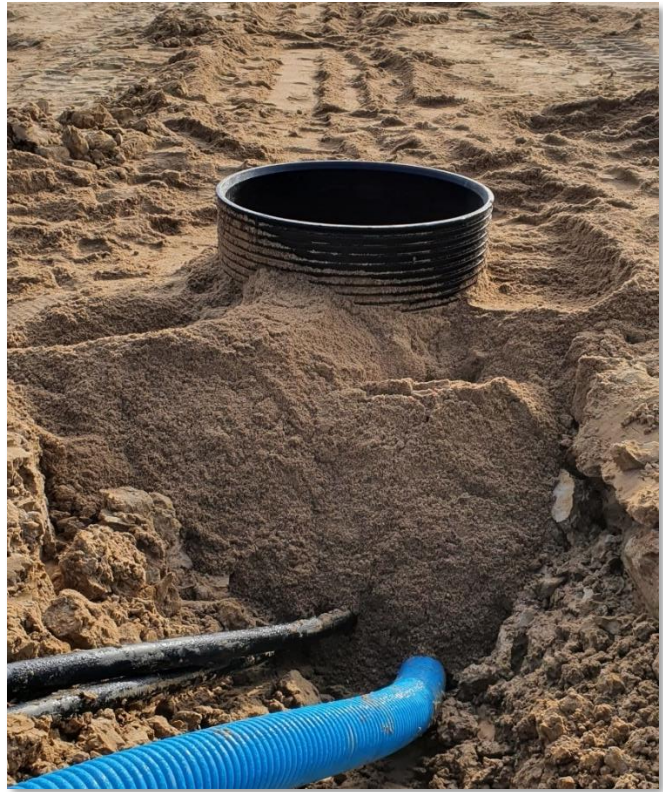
The Ø40 mm 1U pipe geothermal HE (black pipes) buried below the central wastewater pipe. The blue pipe is used for drainage of seeping groundwater
